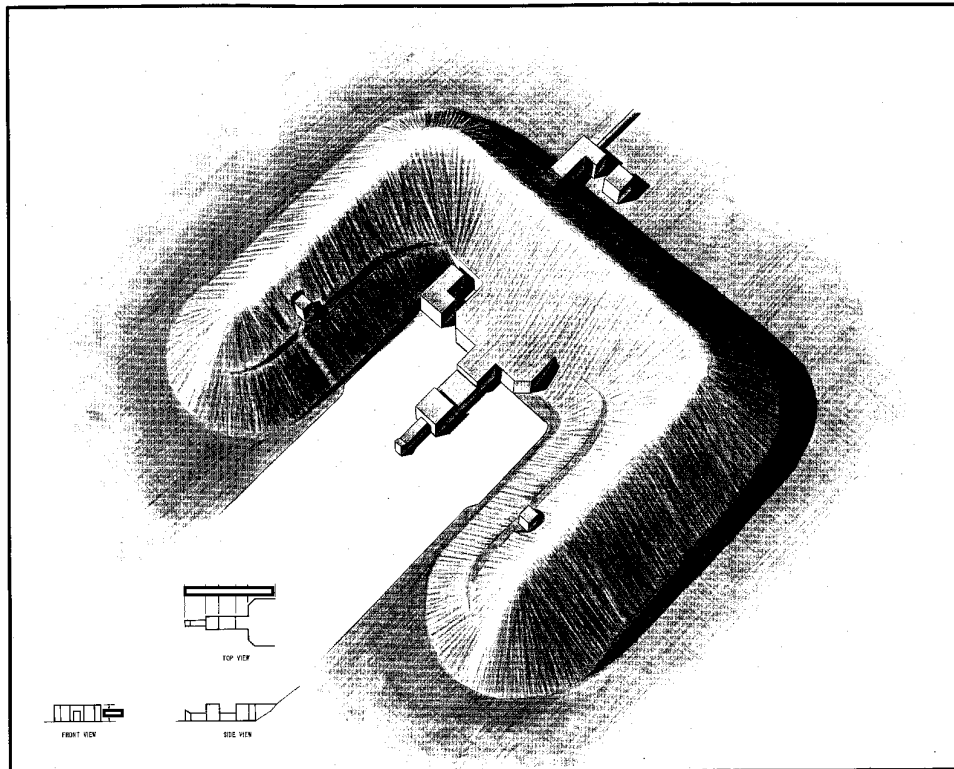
CONCEPT OF TEST POSITION 3, TEST FACILITY No. 3
